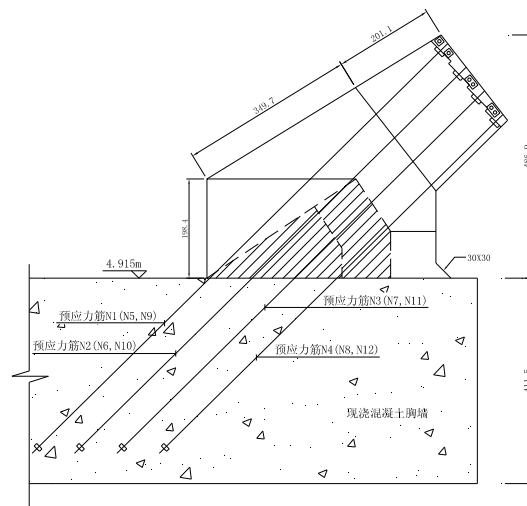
Layout drawing of pre-stressed and lateral precision-rolled reinforced bars anchor
